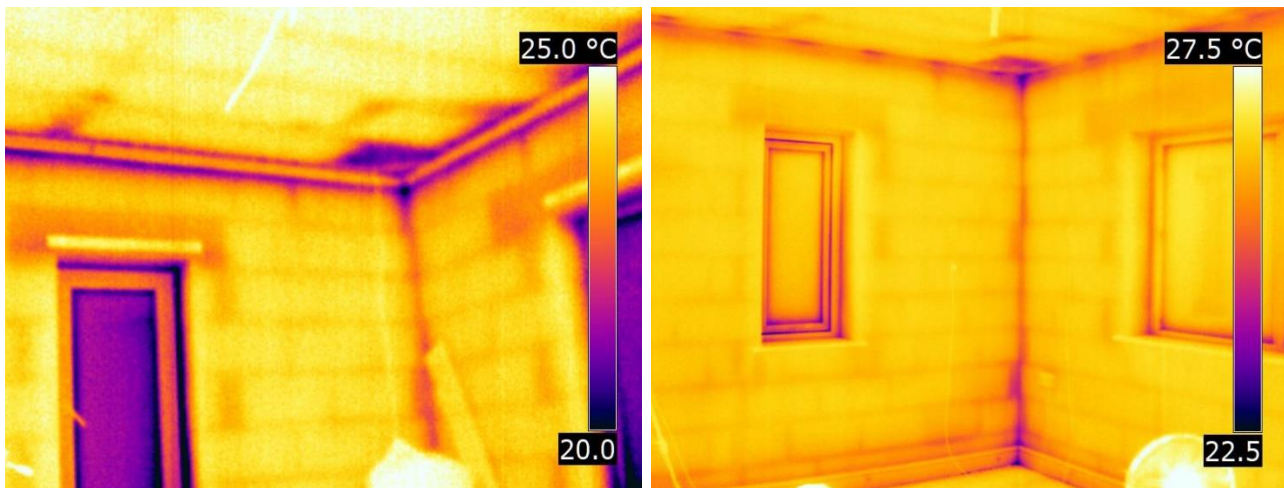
Thermal bridging at reveals around old double glazed window located on external leaf (left) replaced by new triple glazing window unit in a thermally broken frame, relocated post-retrofit in line with external wall insulation (right) resulting in less thermal bridging and a warmer window pane (unpublished image from [78])
